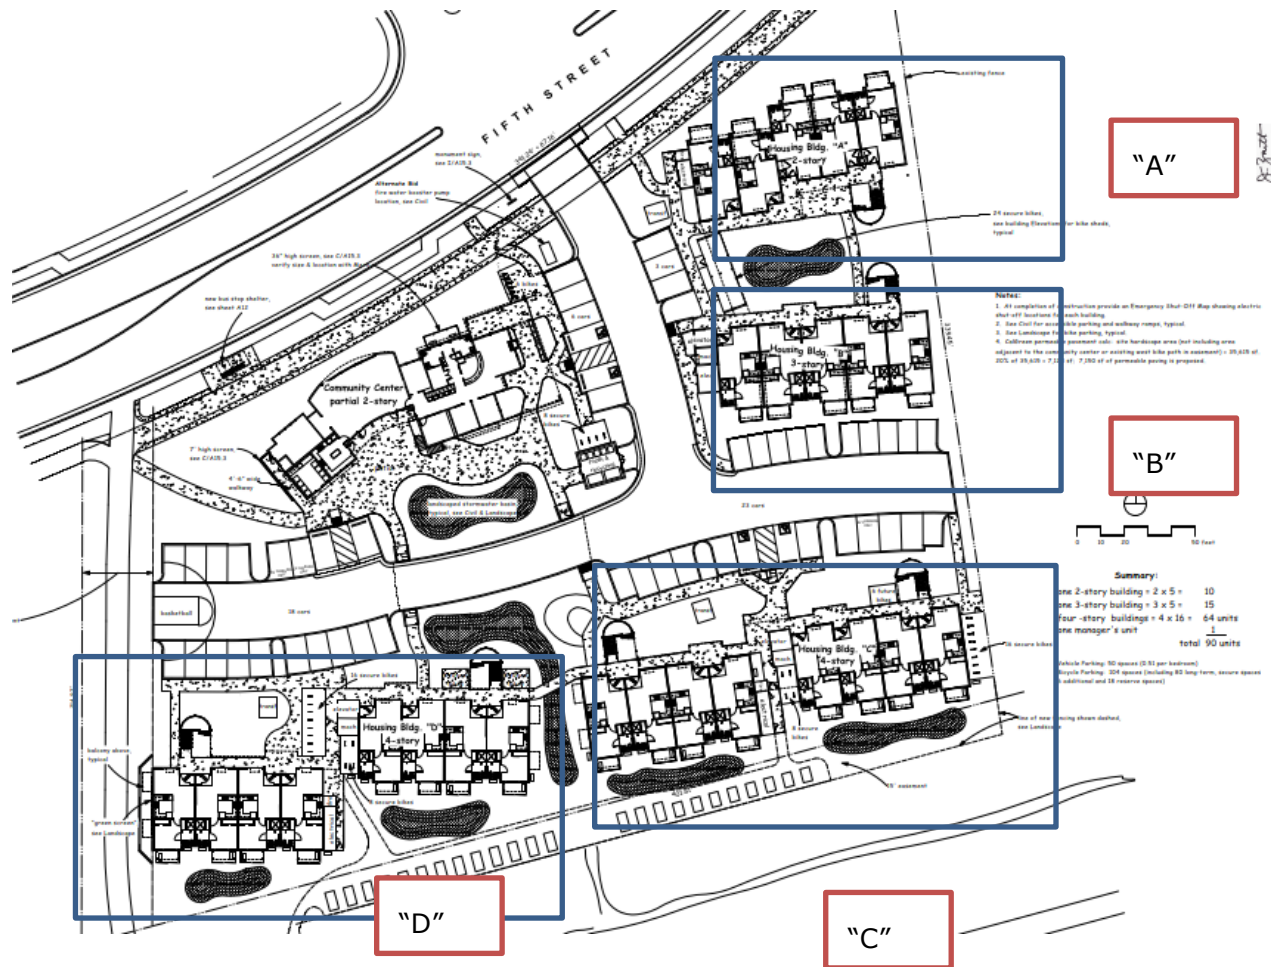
CREEKSIDER PROJECT SITE PLAN
